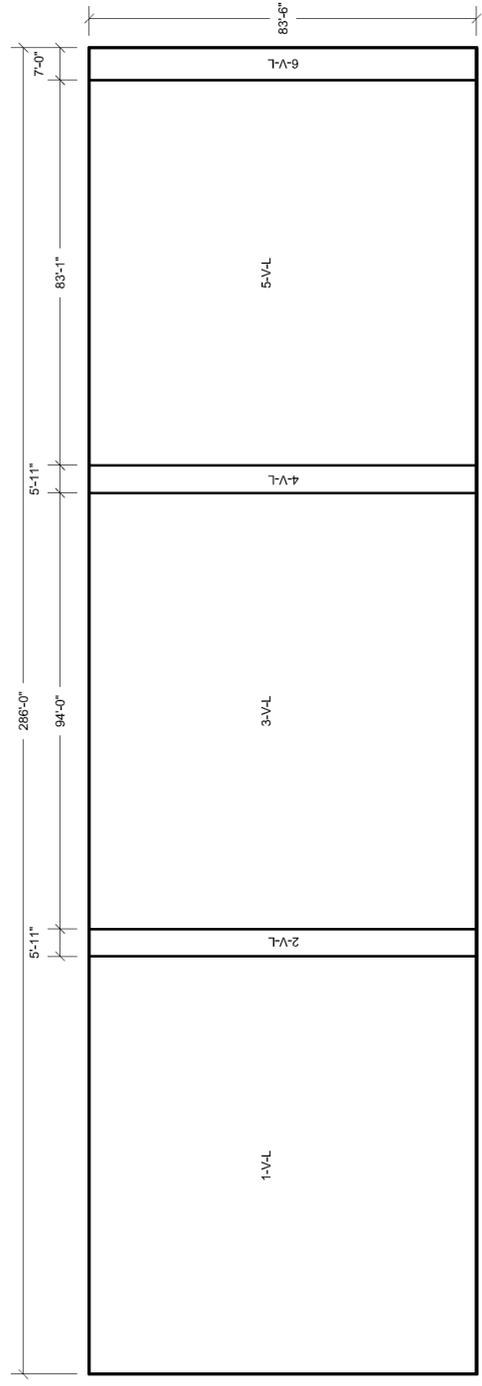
H.6-38: UHS BASIN SOUTH WALL LOOKING NORTH
